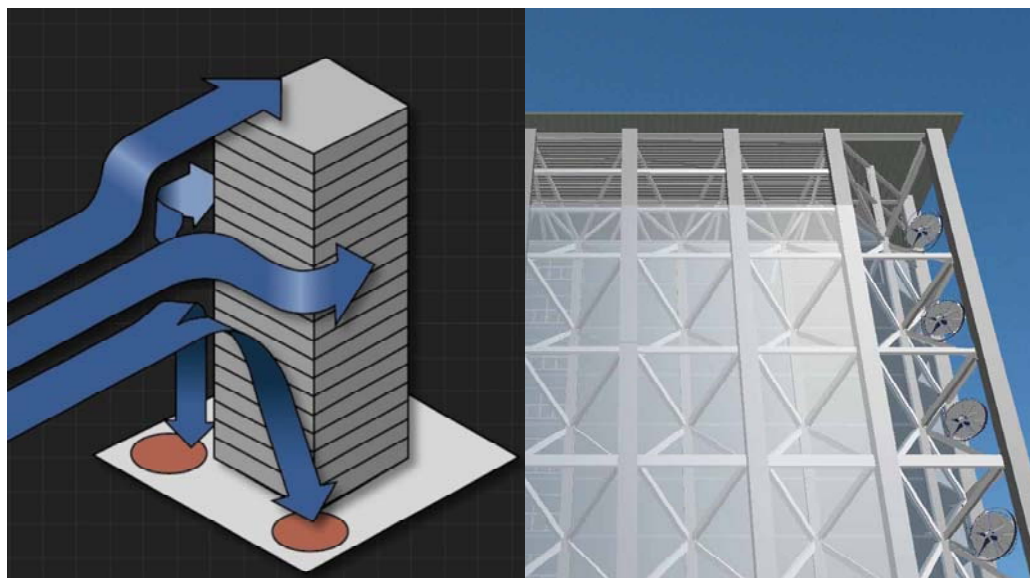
(a) Wind in a tall building (Denoon, Cochran, Banks, & Wood, 2008, p. 323); Wind turbines in a double-layer space structure building
